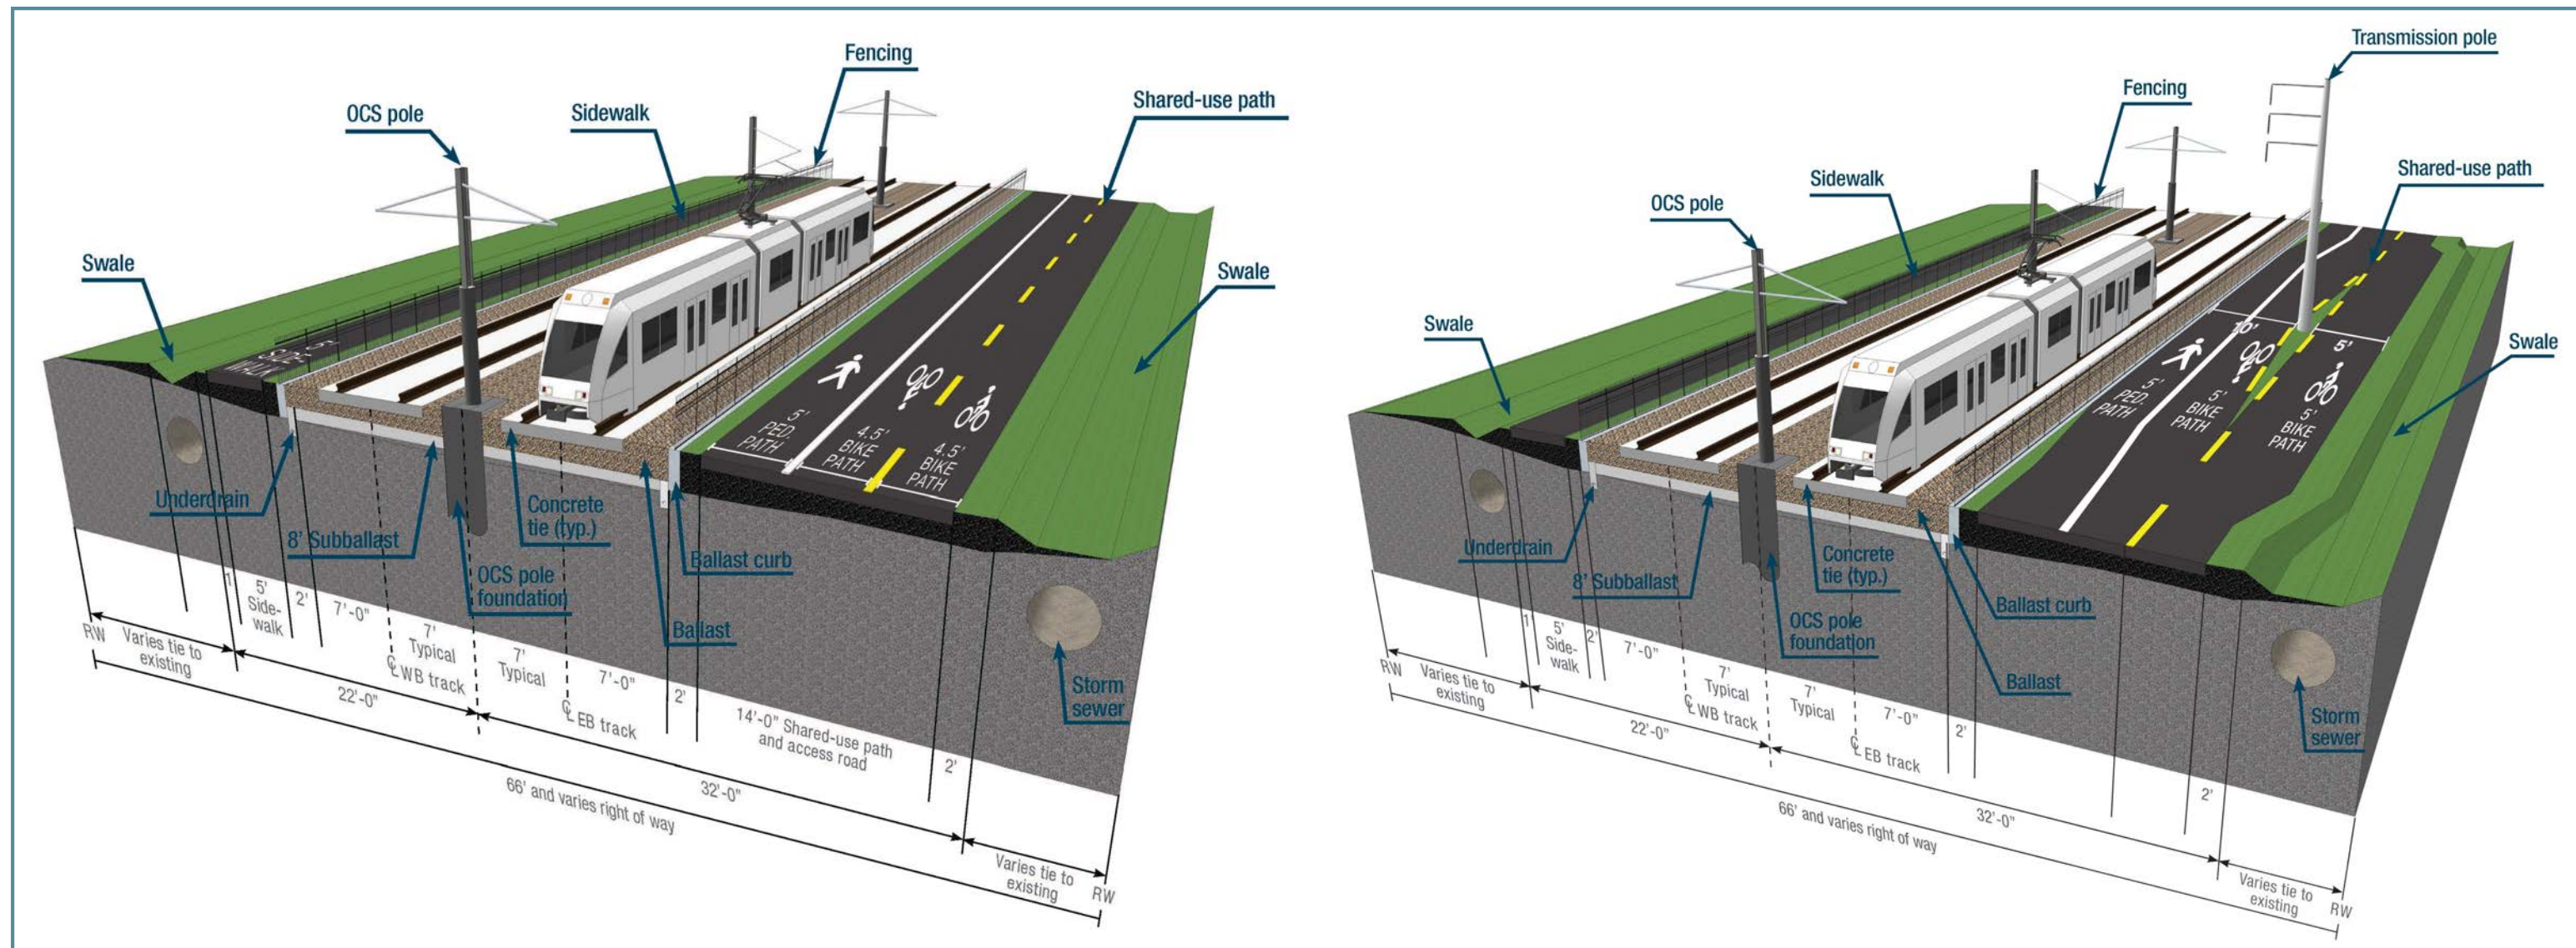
Typical Section – 5-foot sidewalk and 14-foot shared-use path
